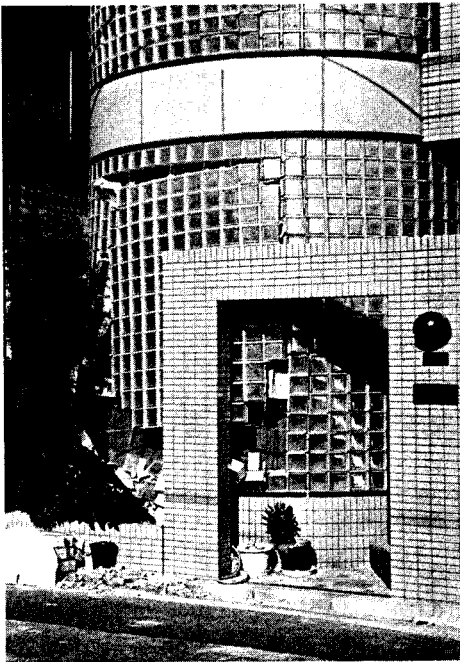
Damaged circular reinforced glass-block masonry wall.
